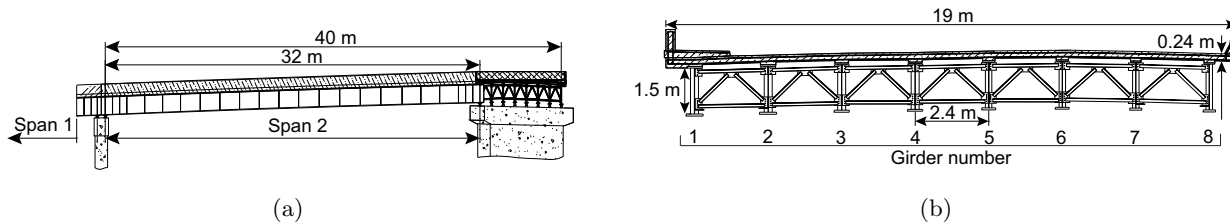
(a) Bridge elevation view; (b) bridge cross-section view (Adapted from [38]).
